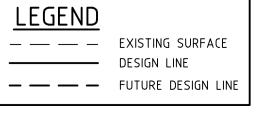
EHL-01-10 Sheet No. 10 of 40
